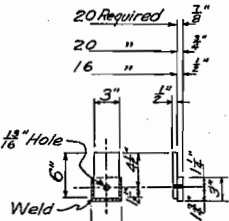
DETAILS OF MIDDLE DIAPHRAGM CONNECTION
